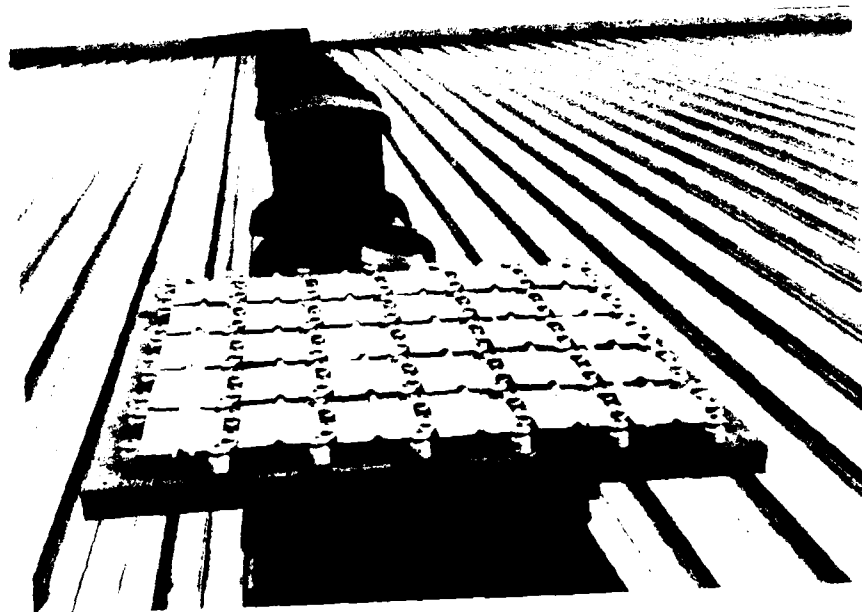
Exposure test rack attached to fire wall between sections of roofing.
